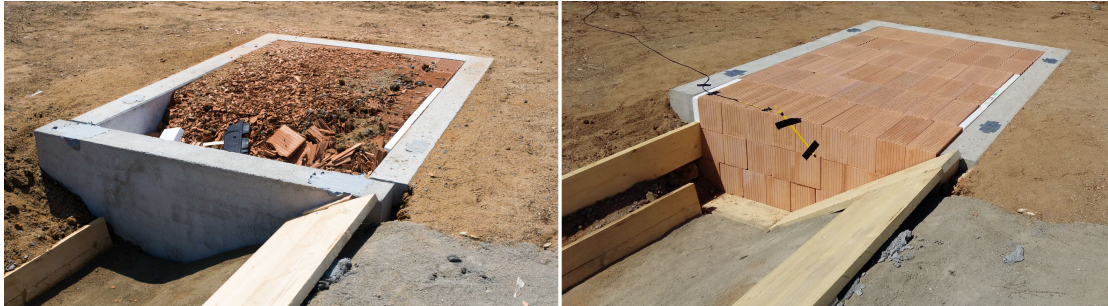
Non-deformable reinforced concrete specimen (left) and deformable specimen of trimmed bricks (right).
